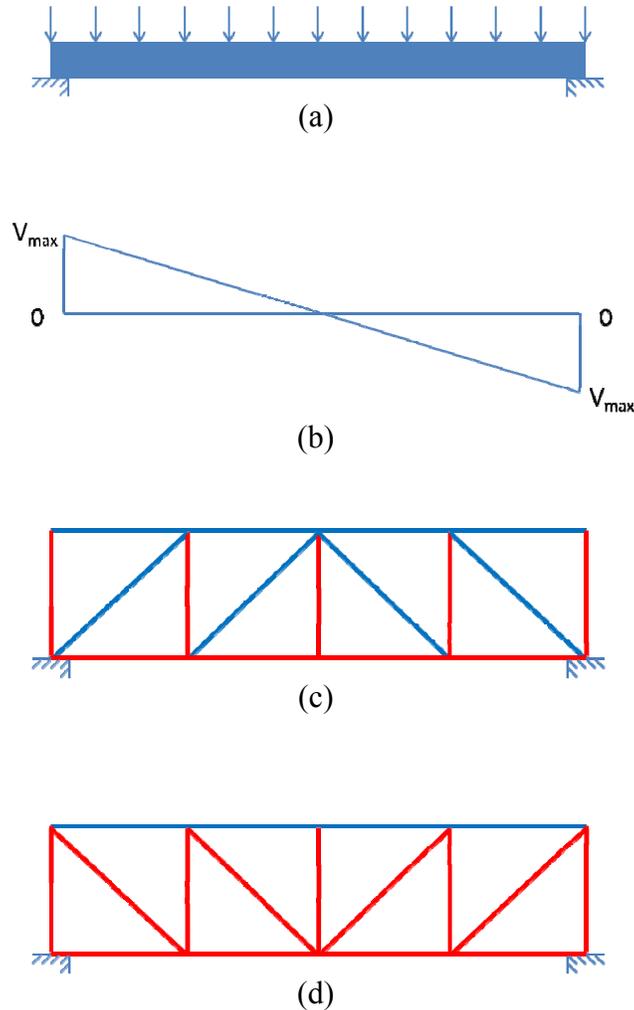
The effect of a uniformly distributed load on axial forces in a truss. (a) shows a simply supported beam with a uniformly distributed load; (b) shows a shear force diagram for the beam in (a); in (c), diagonal braces are oriented to resist shear forces through compression; and in (d), diagonal counterbraces are oriented to resist shear forces in tension. Note: for (c) and (d) tension members are shown in red and compression members in blue.
